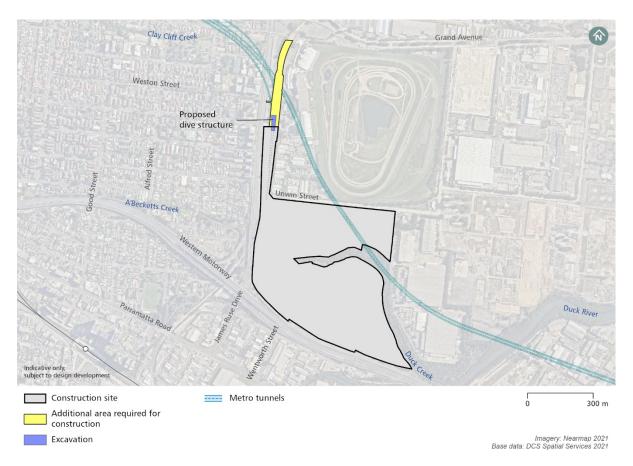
Clyde stabling and maintenance facility indicative construction site (proposed modification)
